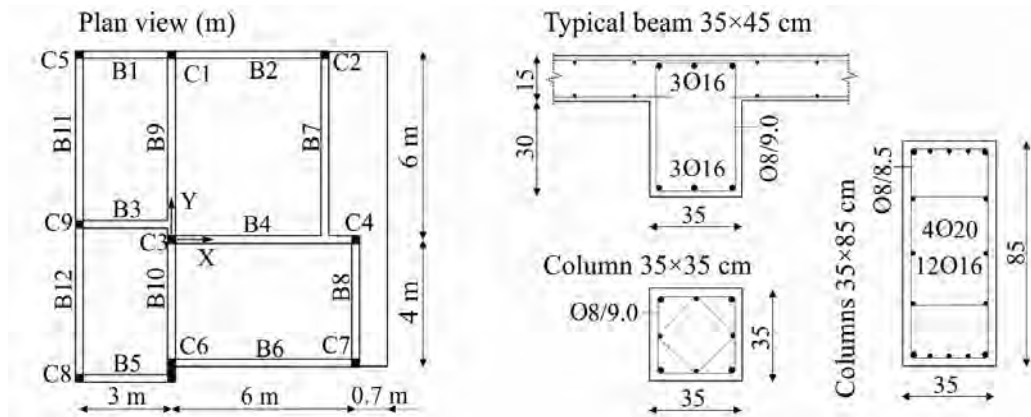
The plan view of the building and typical cross-sections of the columns and beams.
